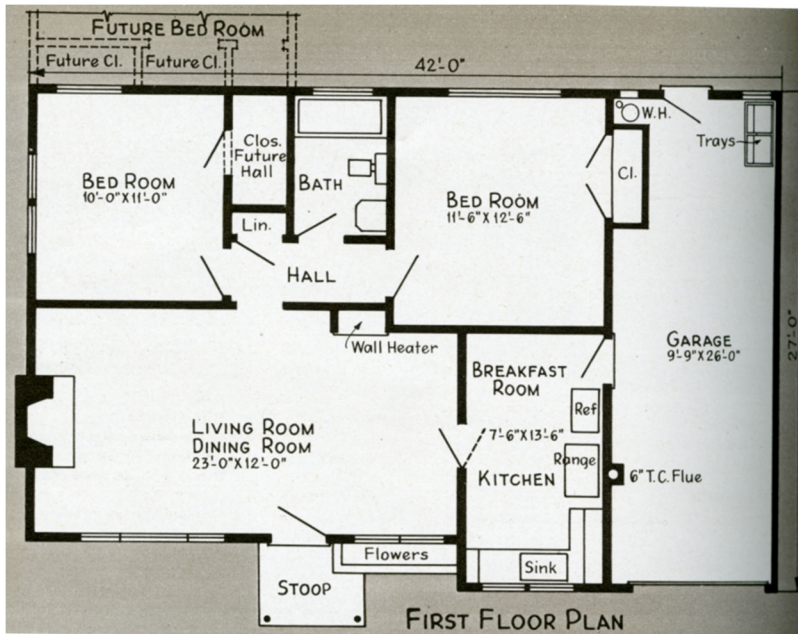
Floor plan of the two-bedroom flat top model showing potential bedroom addition published in *American Builder*, June 1948.
